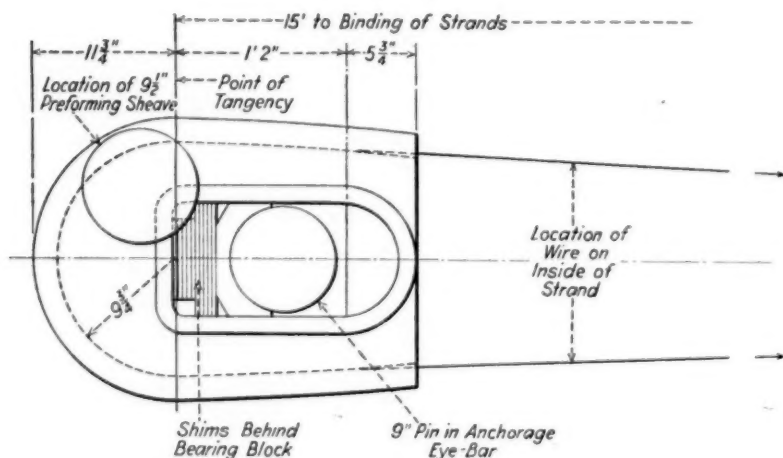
Sketch of Anchor Shoe Used at Mt. Hope Bridge.
